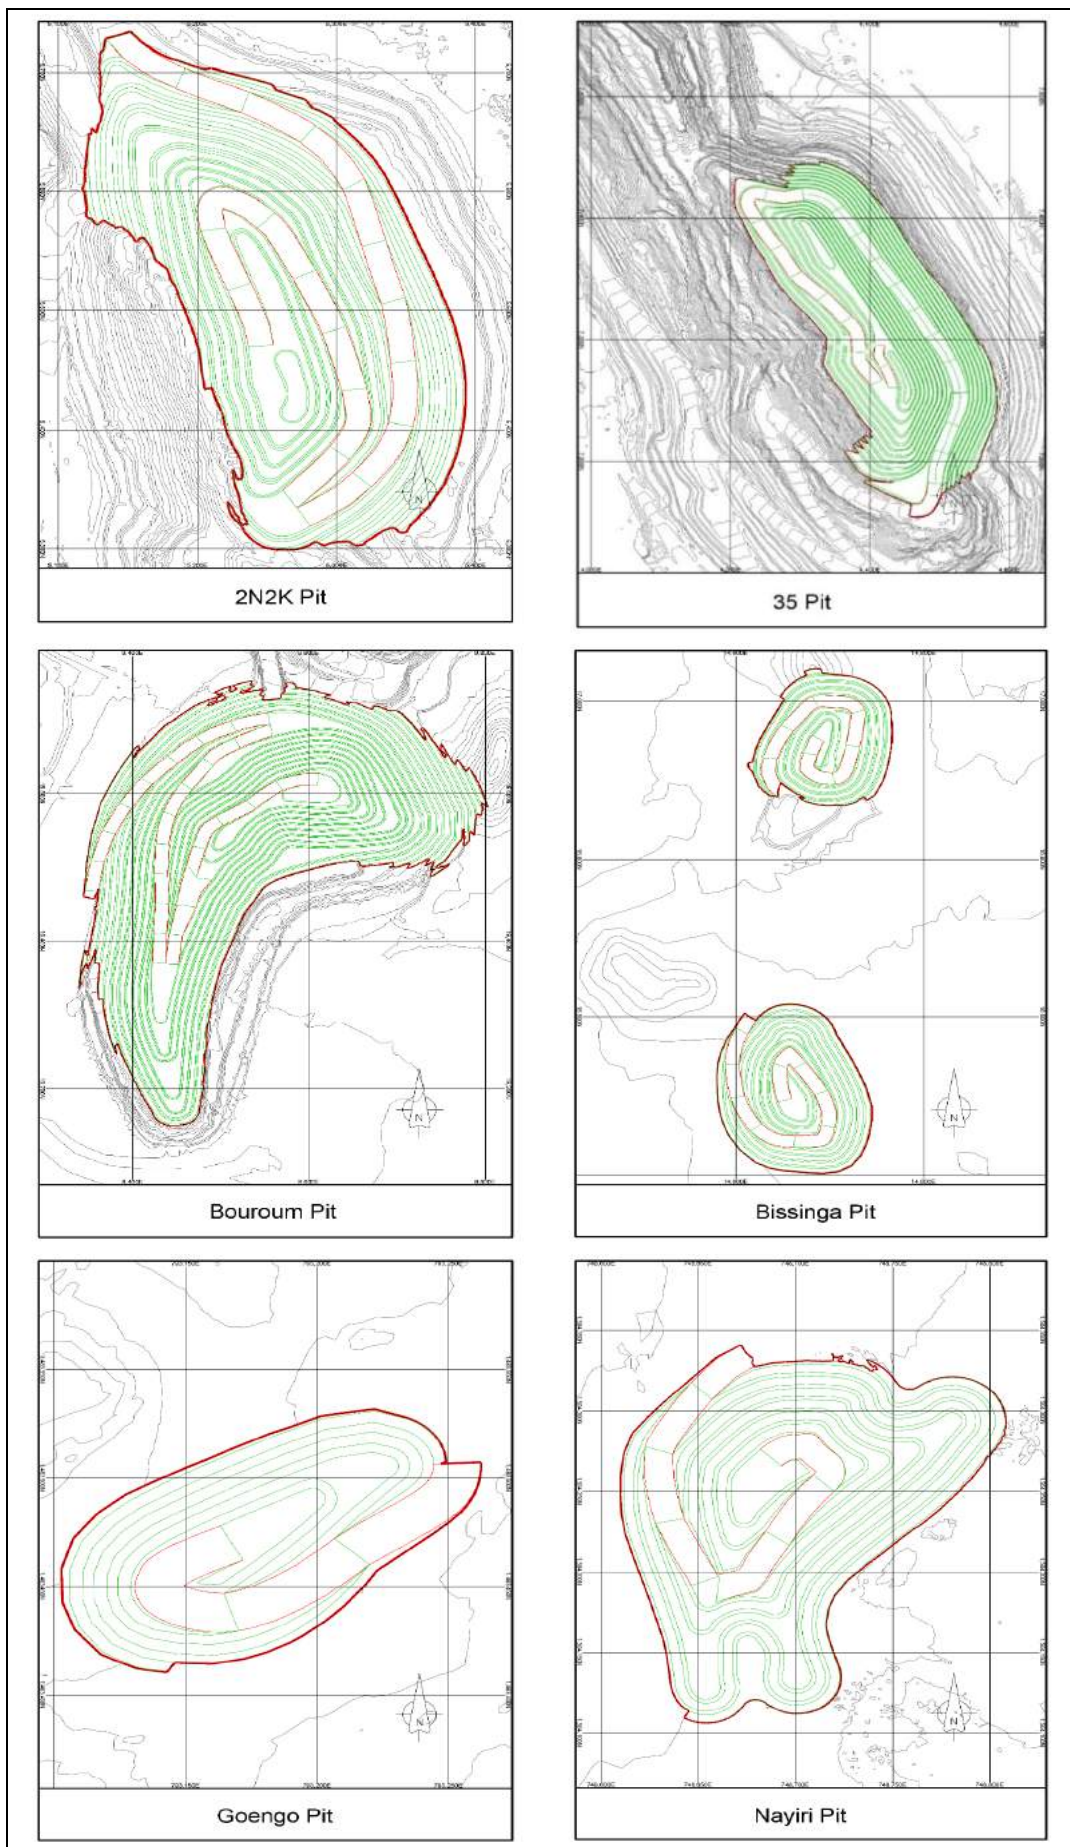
Taparko Open Pit Design (Ore Reserve Case) (Nordgold 2021)
